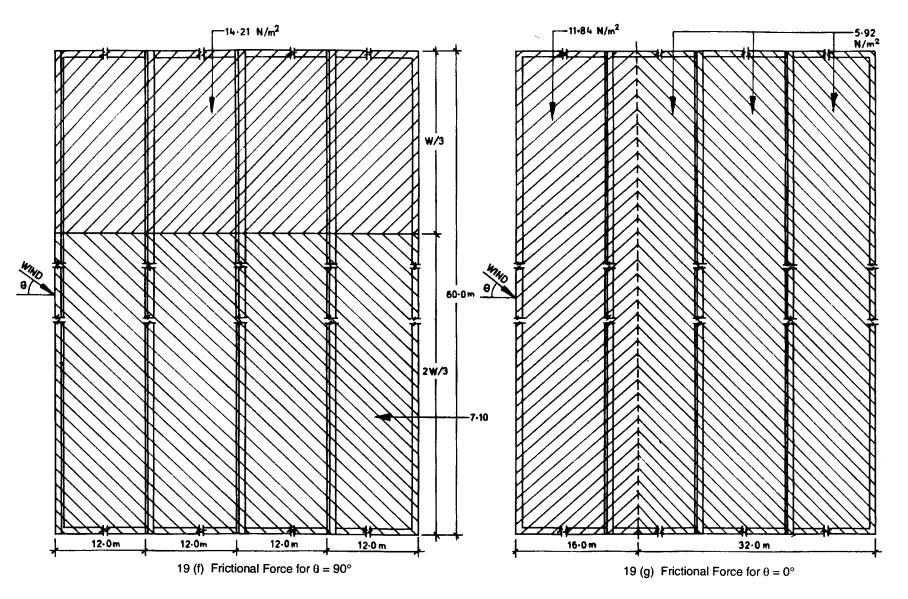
BUILDING WITH MULTISPAN SAW TOOTH SPEED ROOF
